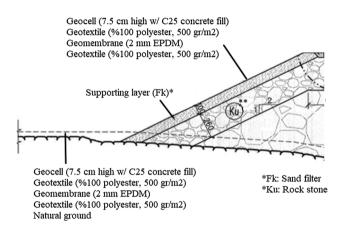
The elements of geosynthetic barrier systems including geocell, geotextile, geomembrane, geotextile, sand filter, rock stone, and rockfill used in a rockfill dam (DSI 2014)
